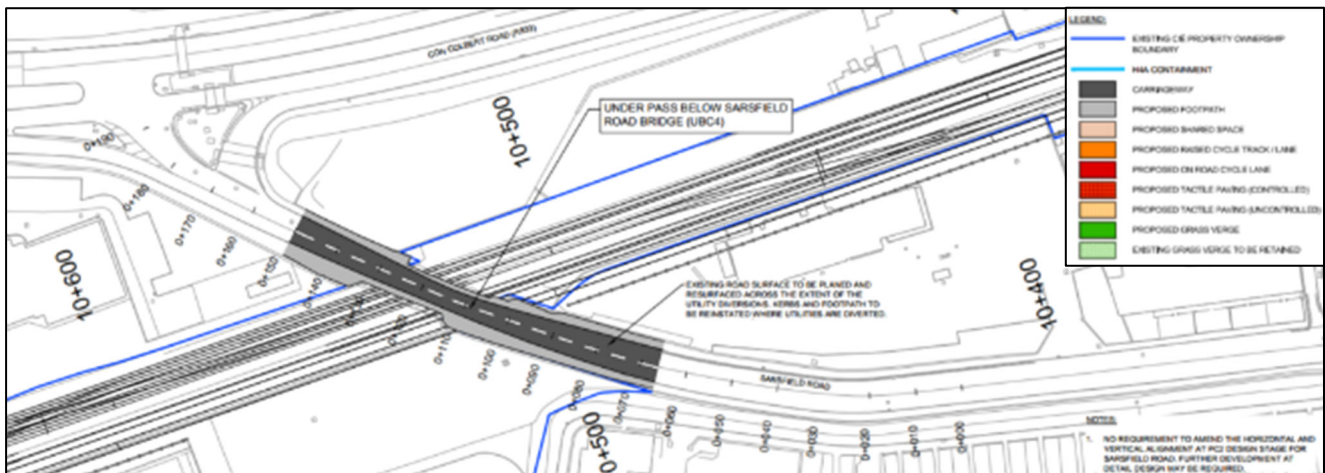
Sarsfield Road - Area of Road and Footpath
